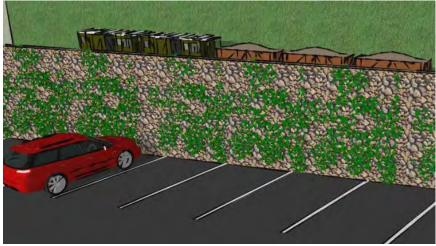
Sketch demonstrating the use of a bio-wall to mitigate railway noise pollution
